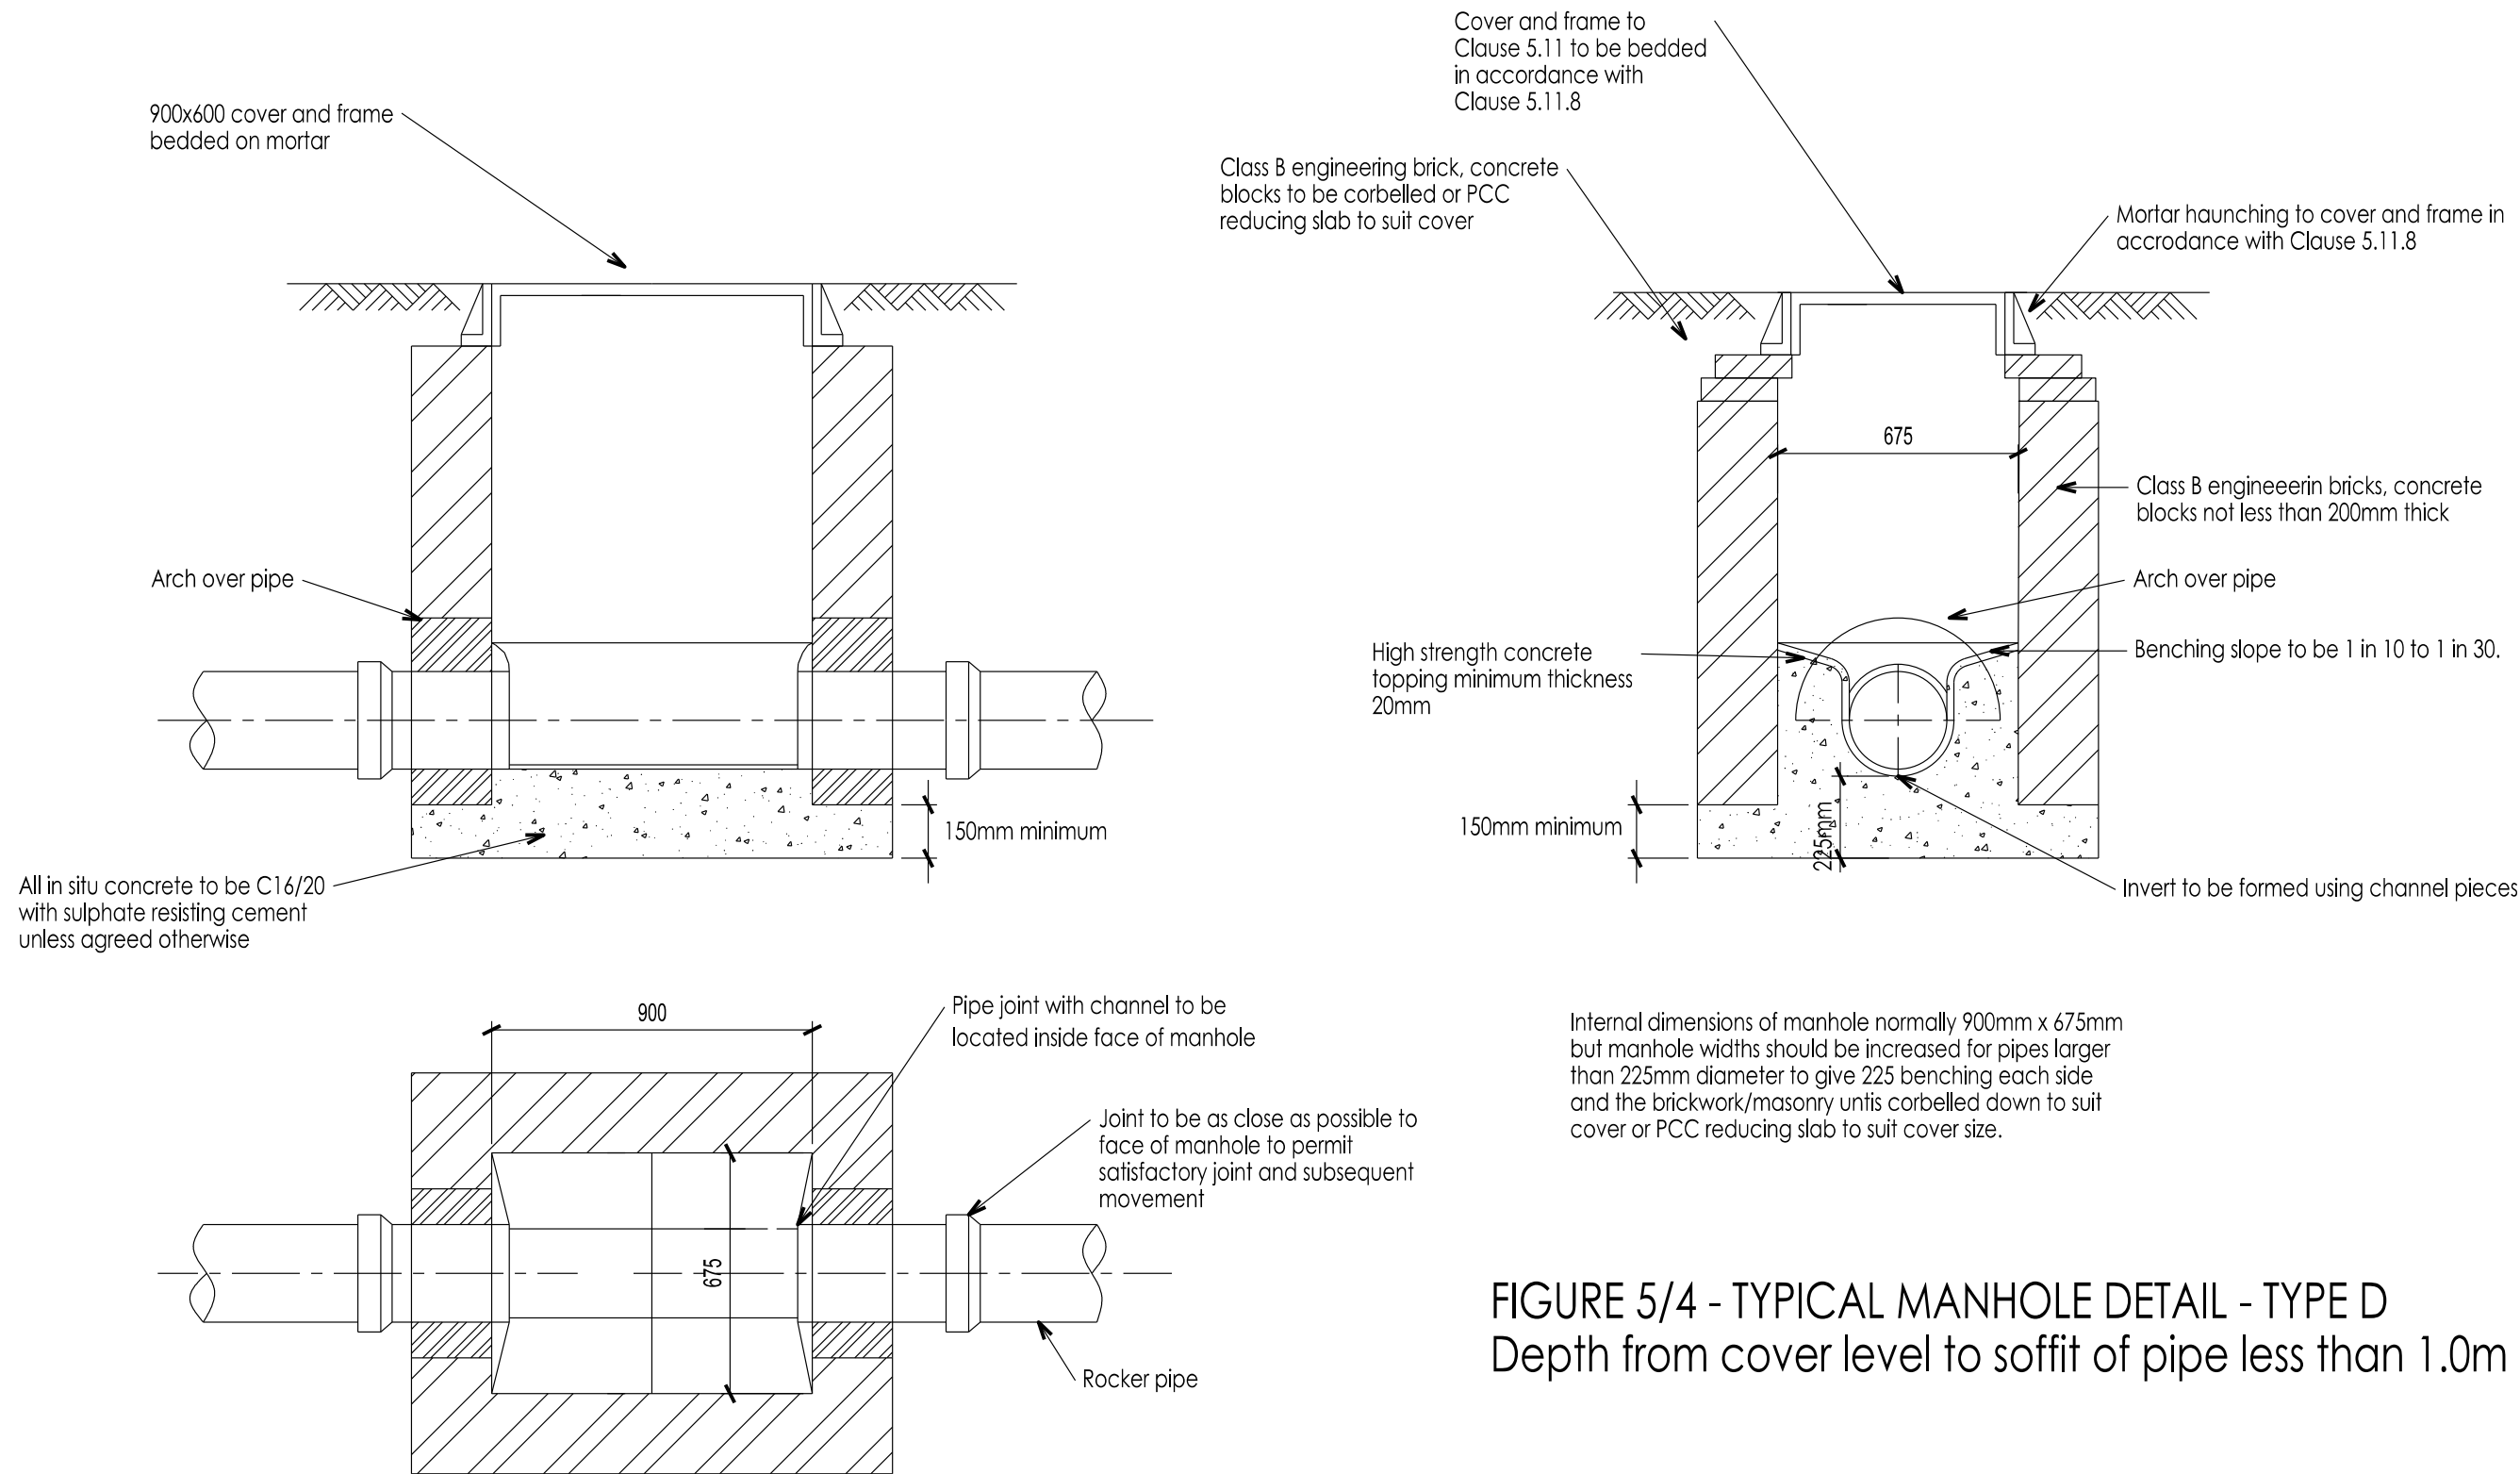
/4 - TYPICAL MANHOLE DETAIL - TYPE D
